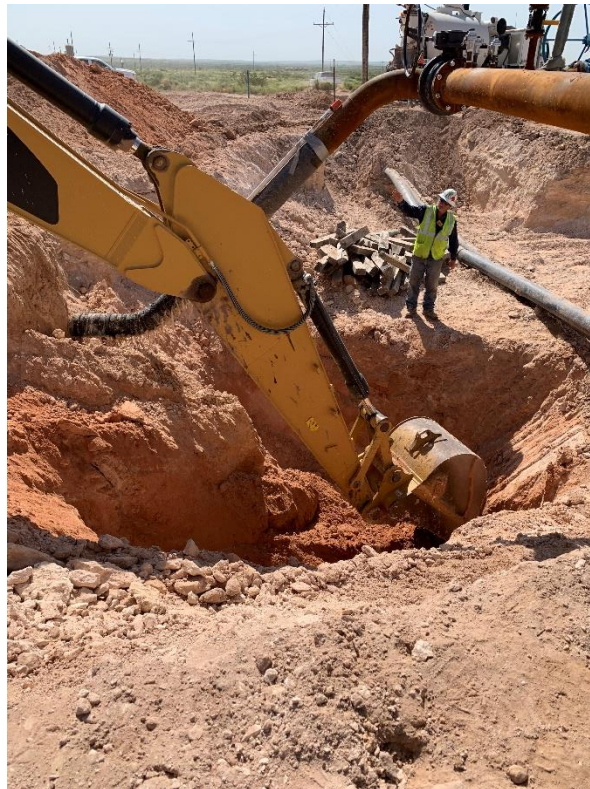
Main Excavation (12ft)– mixture of caliche and soil at depth
